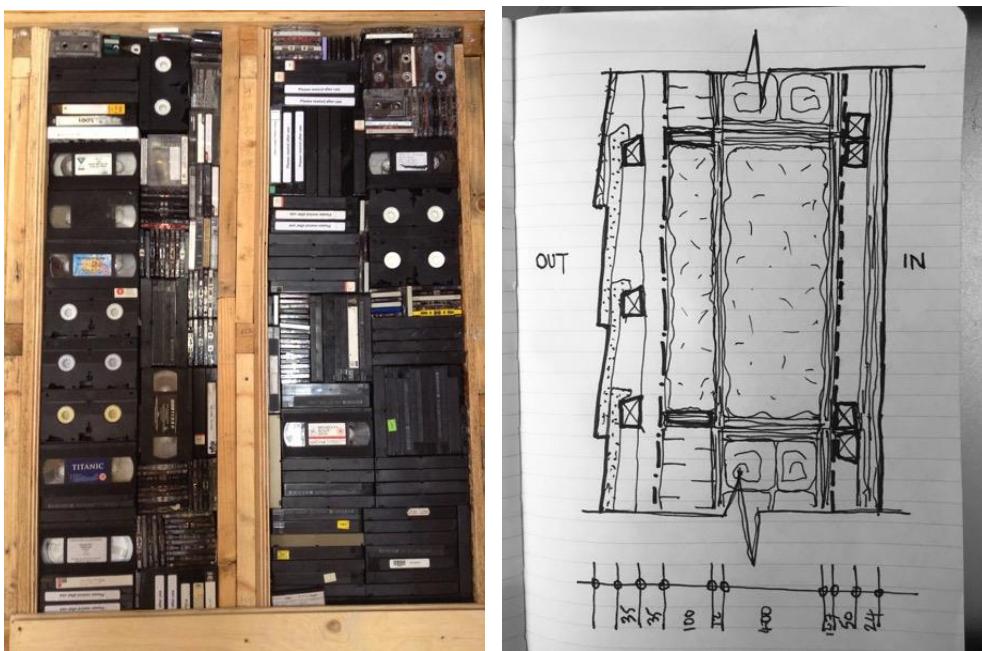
Left: Typical wall section before it was emptied, Right: Typical Waste House wall section drawn in section occupied by Prototype 2 at the Brighton Waste House
